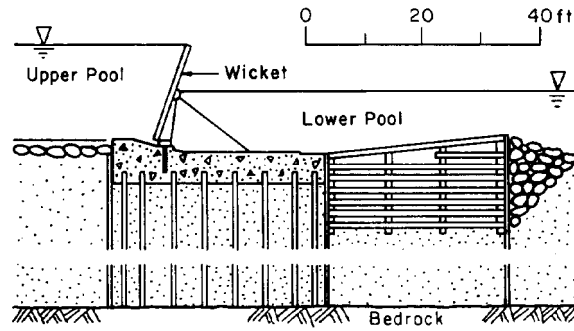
Typical section of a navigable pass portion of a wicket dam.
